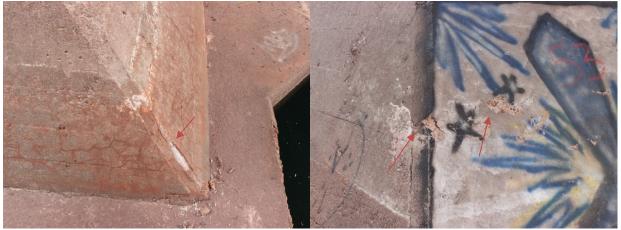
Delamination crack noted, and patter cracking at bottom of base of Bent 49 on north side of dock.
